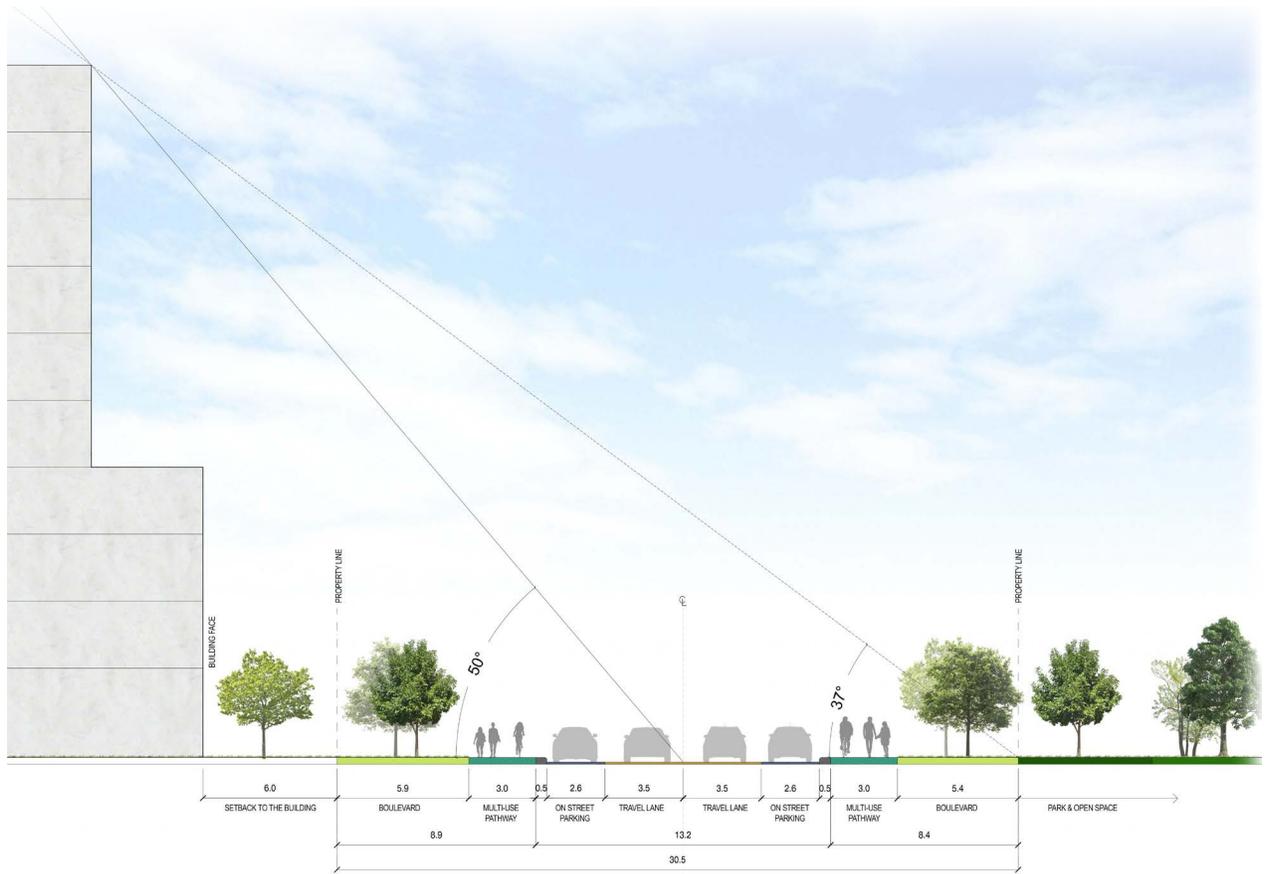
Proposed Angular Plane to Silvercreek Parkway - Adjacent to the Neighbourhood Park
